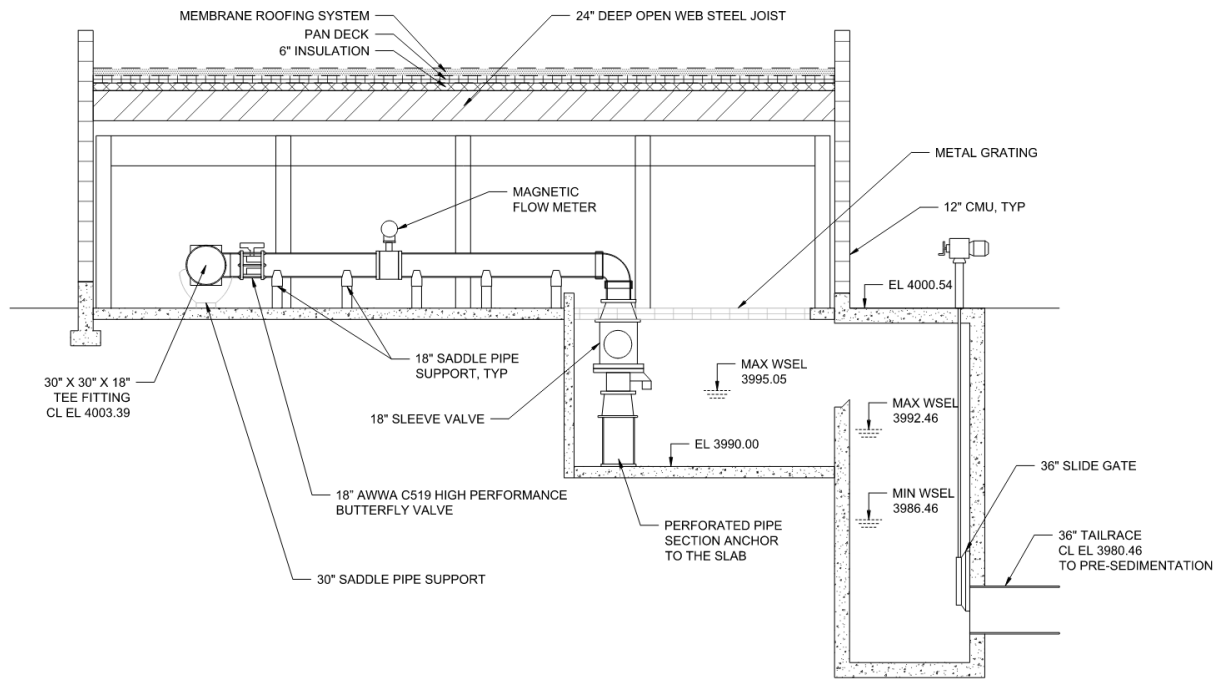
Building Section of Proposed Outback In-conduit Hydropower Facility, Sleeve Valve Assemblies
